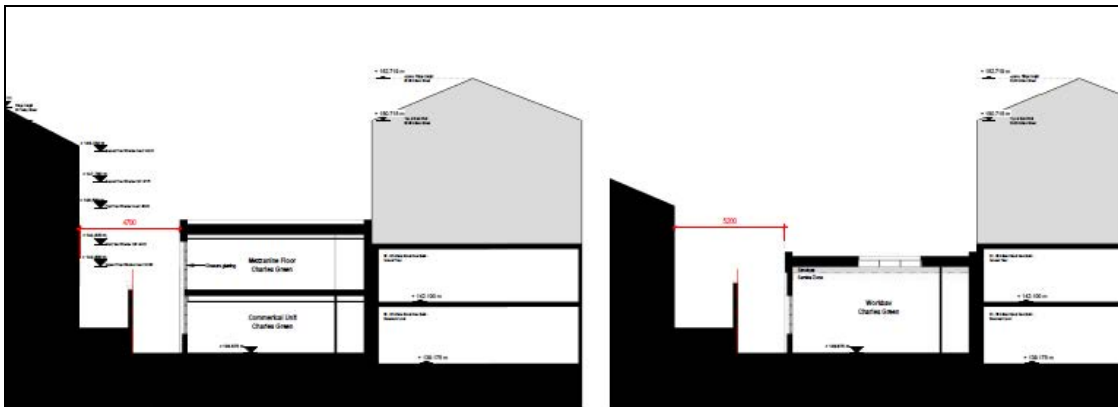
Separation distances to rear wing at 36 Tenby Street of 4.7 and 5.2 metres
